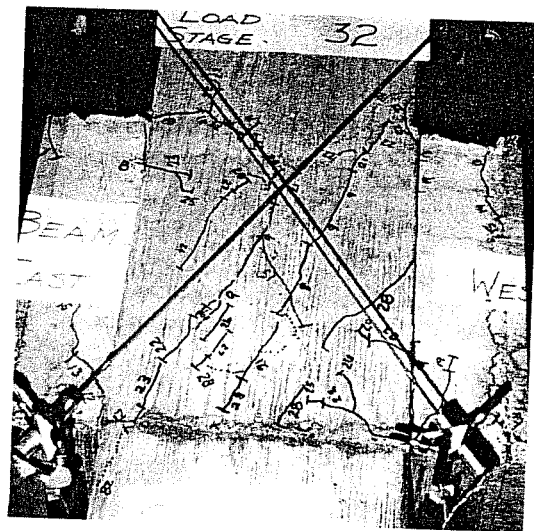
Joint cracking pattern in second cycle of Specimen IV
